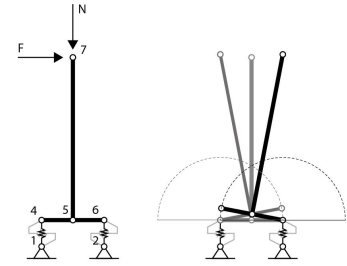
Test model of wall with cracked cross-section and allowable displacements.
